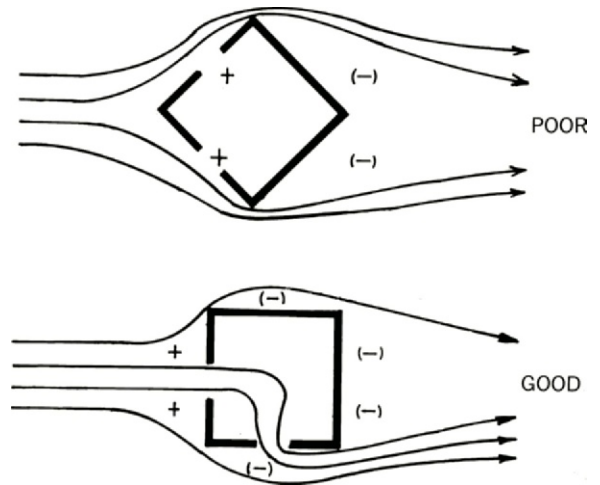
Ventilation from windows on adjacent sides can be poor or good, depending on wind direction.
